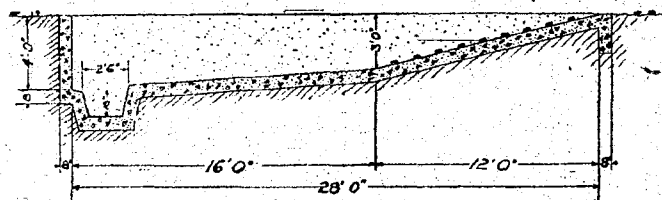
Sectional Drawing of Shallow Concrete Manure Pit.
